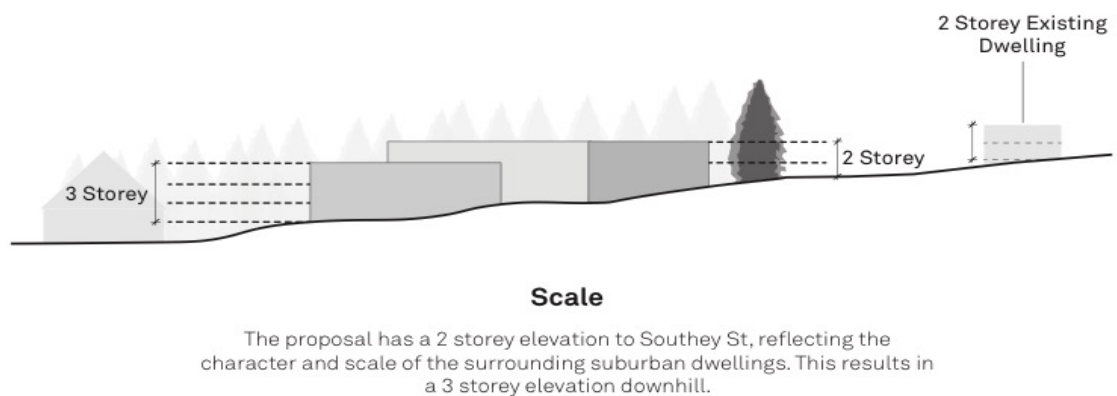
Indicative site section prepared by Snohetta showing form and scale of potential residential buildings.
